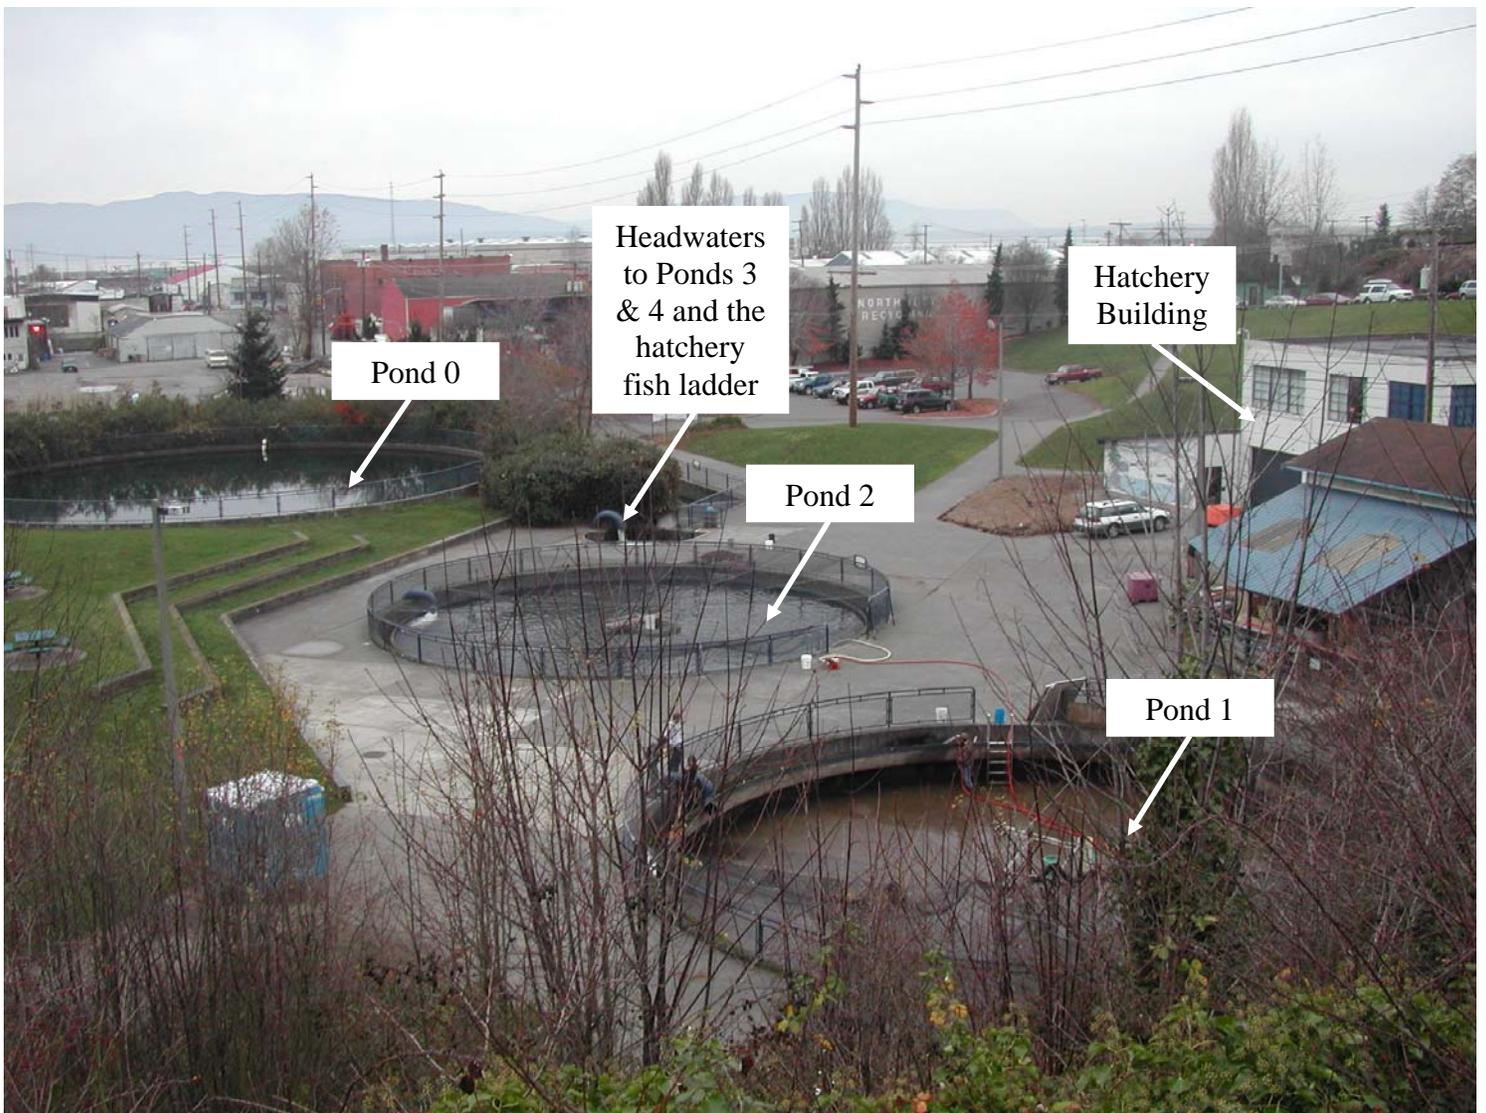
Looking south from the Dupont Street Bridge. Whatcom Creek is immediately to the left.
